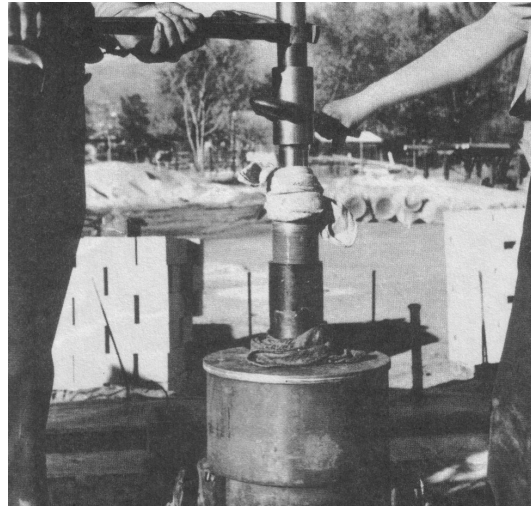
Making a shaft joint. Note the clean rag and wooden apron protecting bowl unit and tube bearing.
